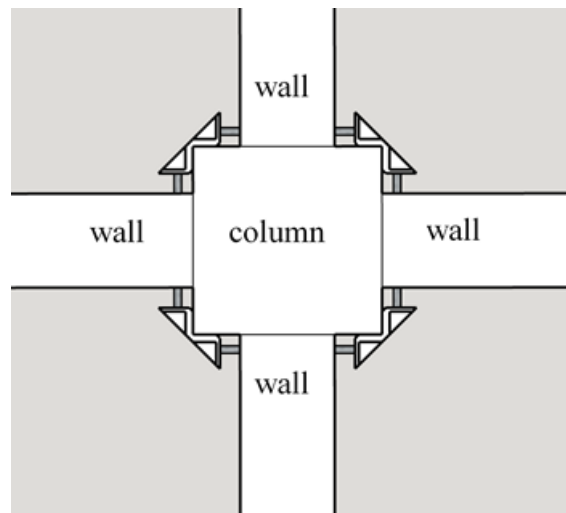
Setting up the steel-rod collars in the column with masonry infill wall
